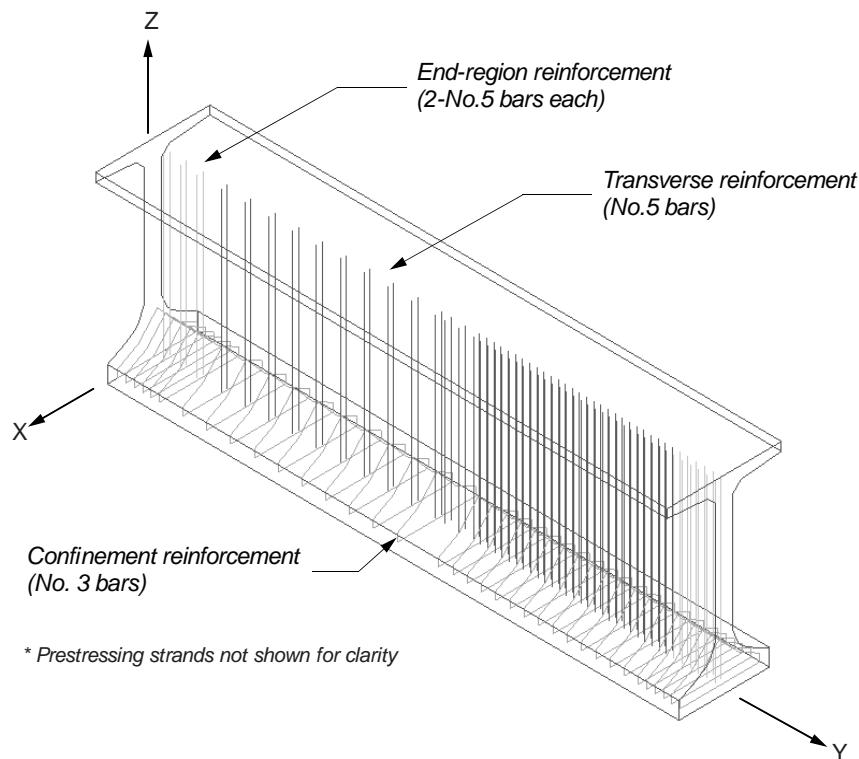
FIB-78 Model reinforcement configuration (concrete mesh and prestressing strands not shown for clarity)
